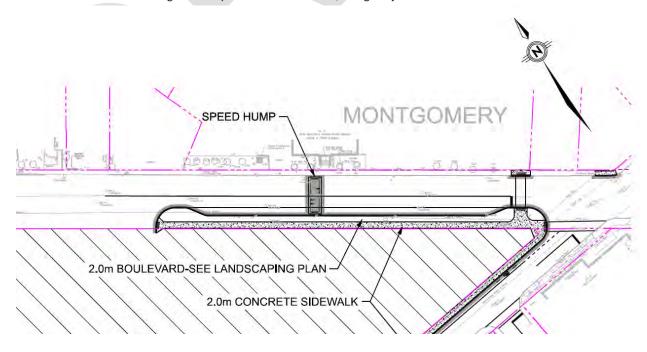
Proposed Road Modifications, Selkirk Street / North River Road
